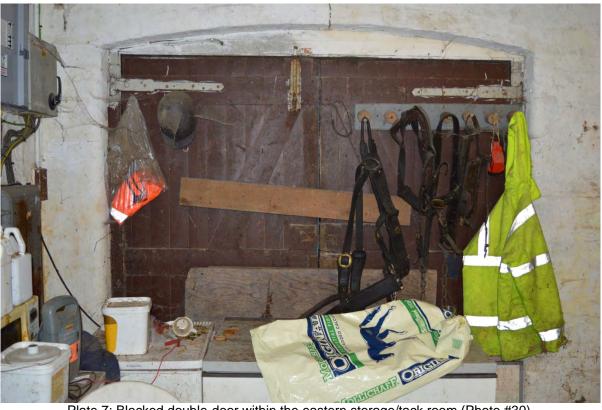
Blocked double-door within the eastern storage/tack room (Photo #30).
